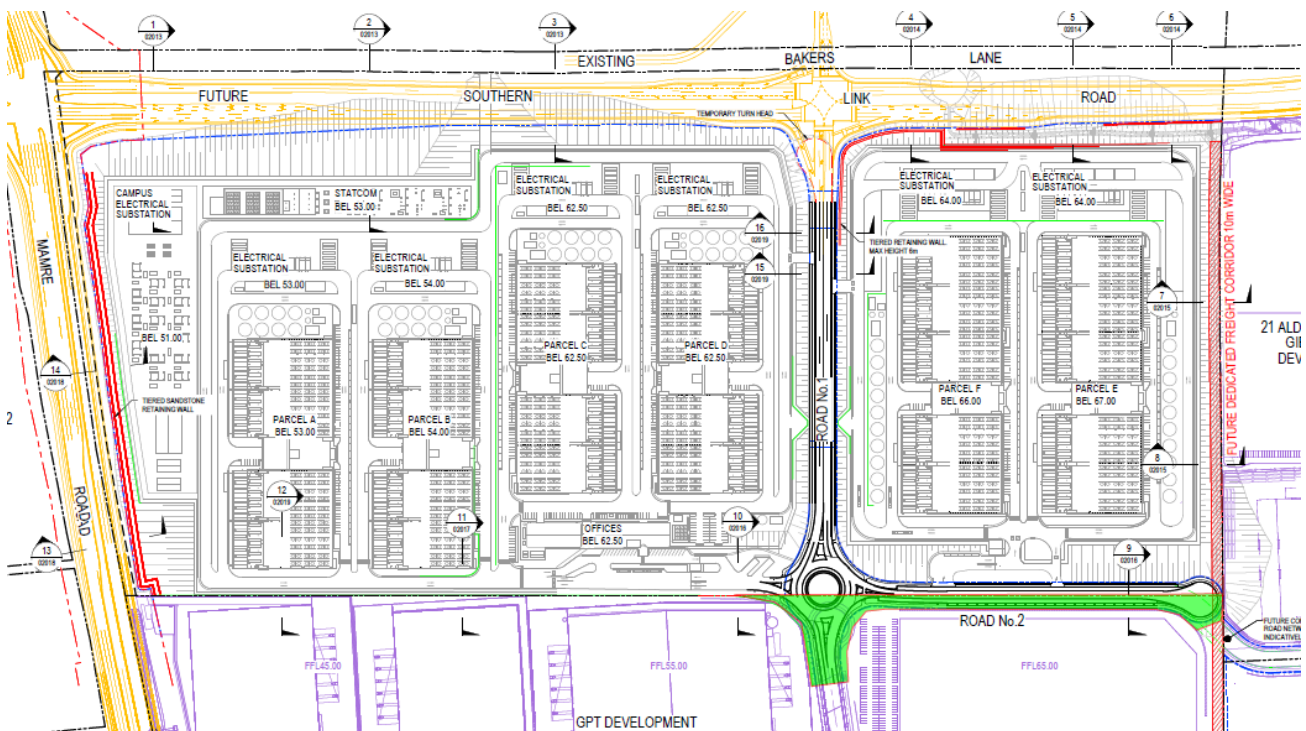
Civil Engineering Plan Markup showing works proposed on the site to the south at 754 Mamre Road¹.
